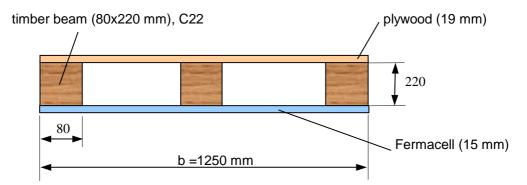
Cross-sectiondDimensions of the prefabricated timber floor elements.
